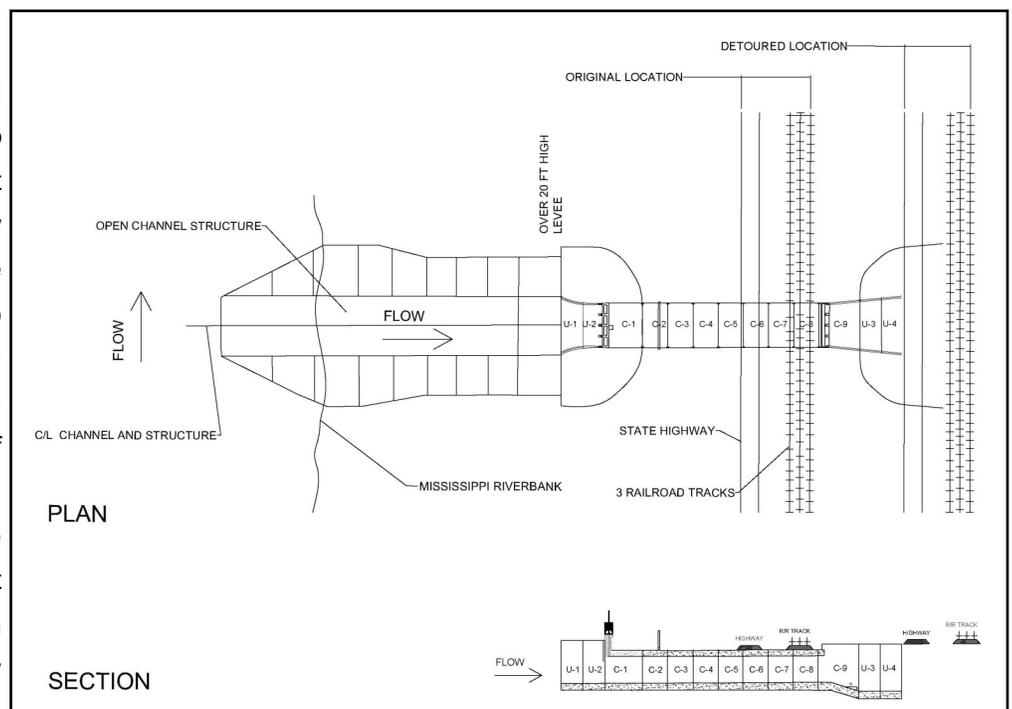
PLAN AND CROSS-SECTION OF THE FRESHWATER DIVERSION STRUCTURE
